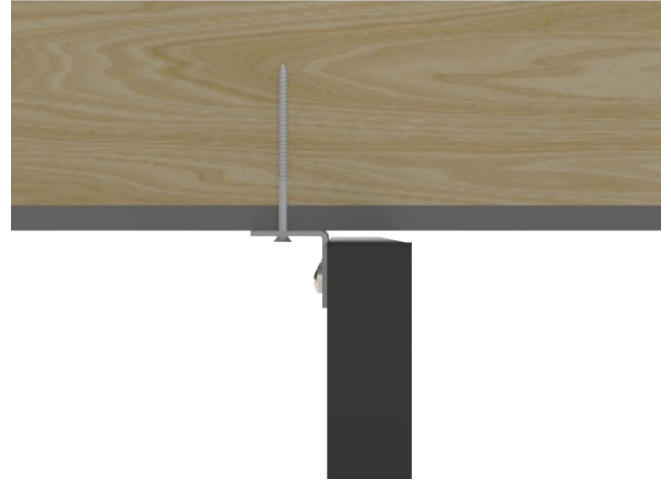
Side view profile render of WSDQ showing a fully installed frame with aperture mount.
